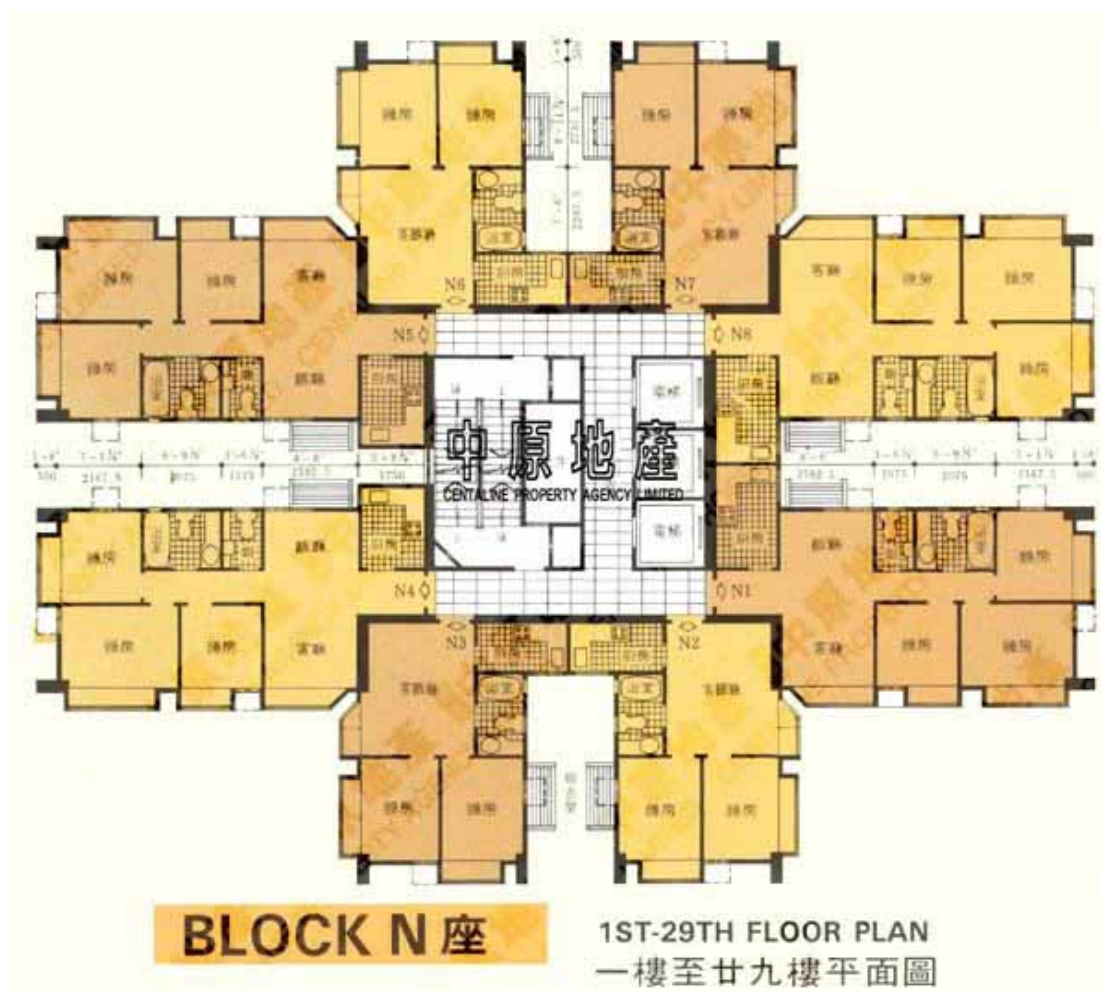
Building Plan of Block N of Sunshine City (In affecting group)
